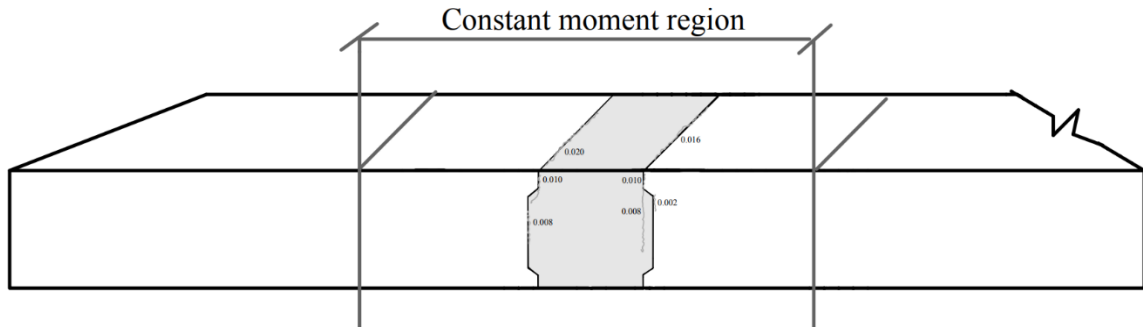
Crack Propagation for Proprietary Short-Term Specimen at 30 % of Final Load
